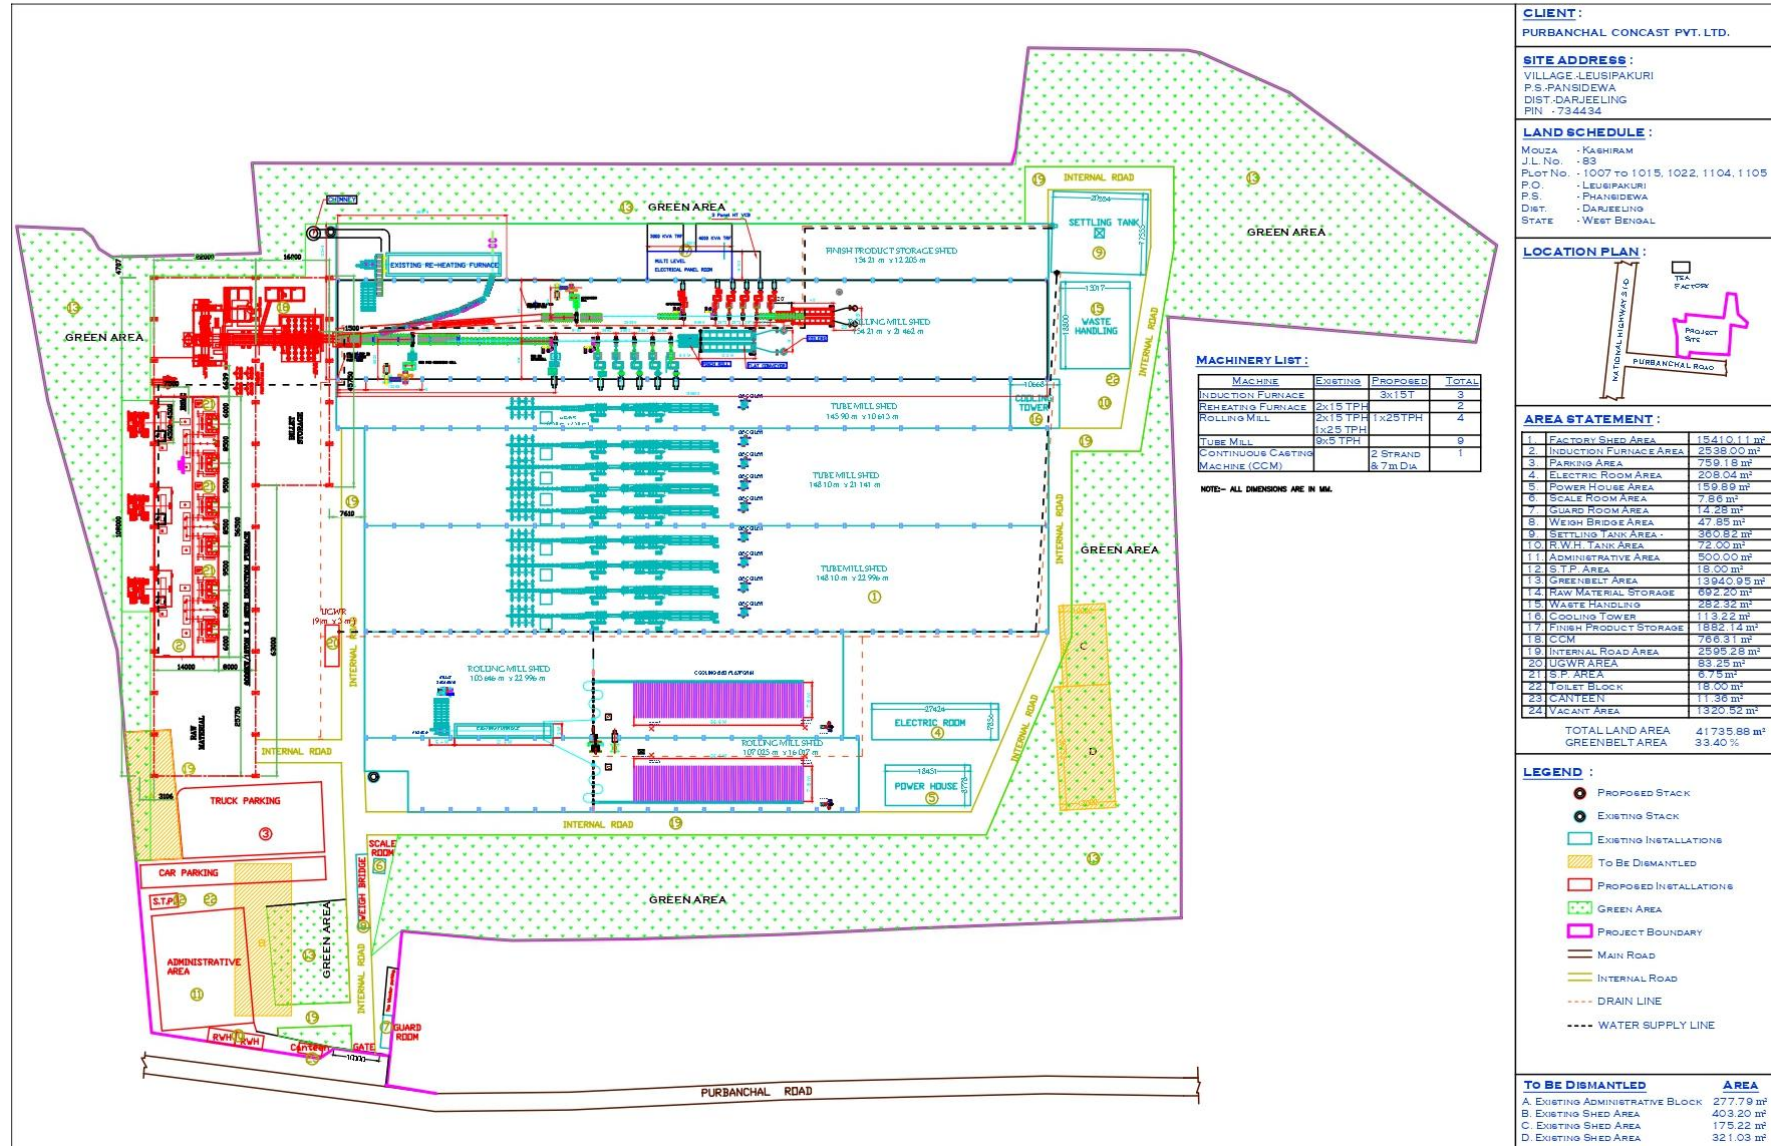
Plant Layout Showing Existing and Proposed Project Areas
